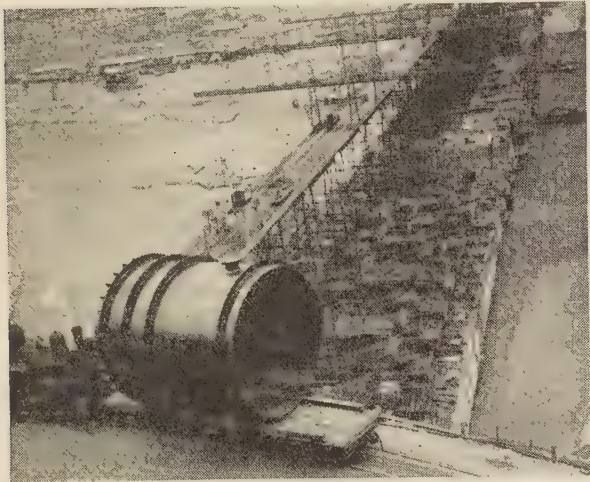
RAILROAD TRANSPORT OF MAIN-UNIT PENSTOCK SECTION
